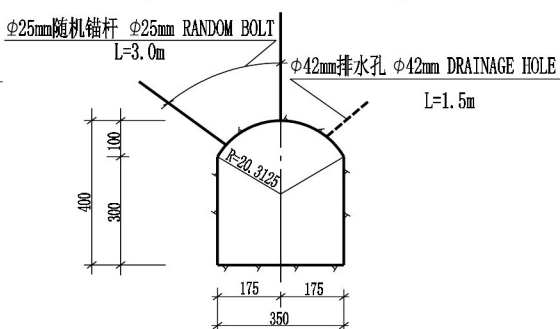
LAYOUT OF CONSTRUCTION DRIFTS OF THE HEADRACE TUNNEL OF CONSTRUCTION POWER PLANT
